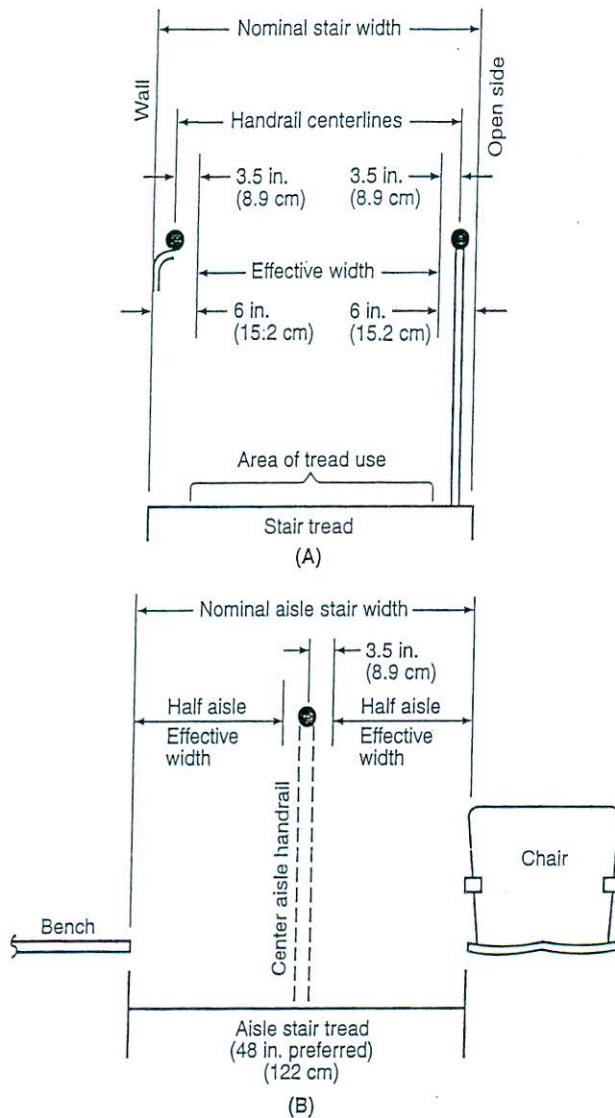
Measurements of Effective Width of Stairs in Relation to Walls, Handrails, and Seating
